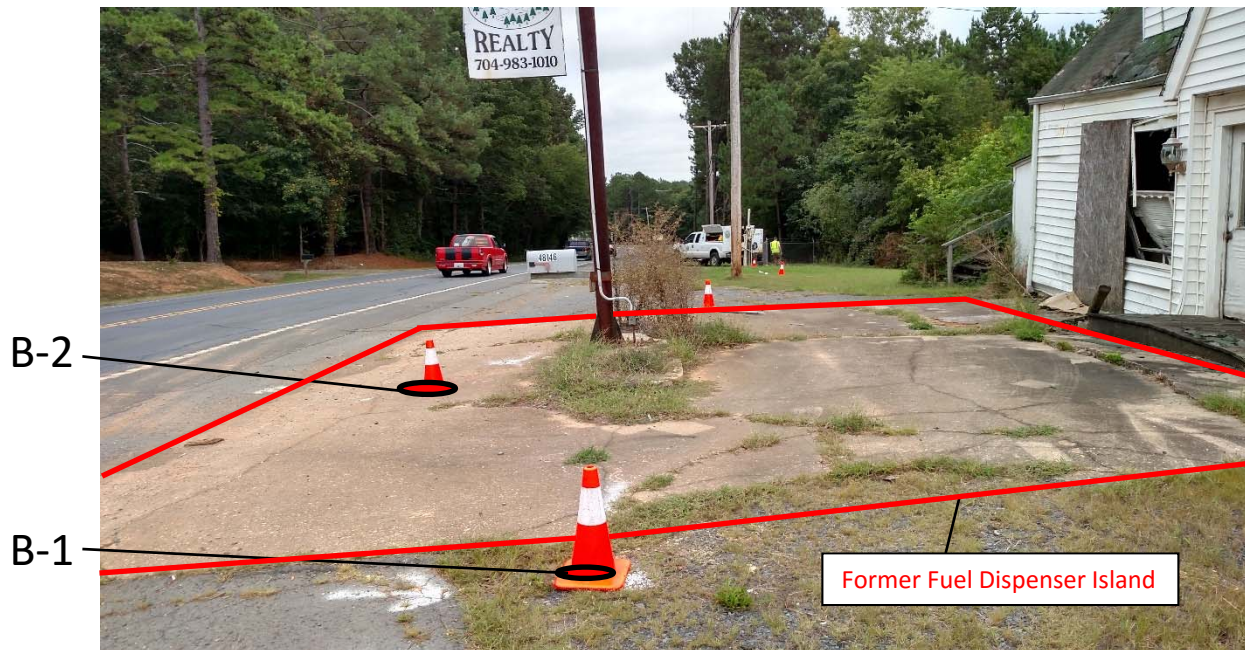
Boring locations B-1, B-2, and a former dispenser island, facing southeast.
